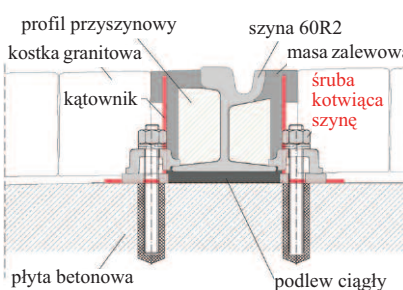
Rail fastening structure in place of collision with the rail anchor based on design documentation [9]
